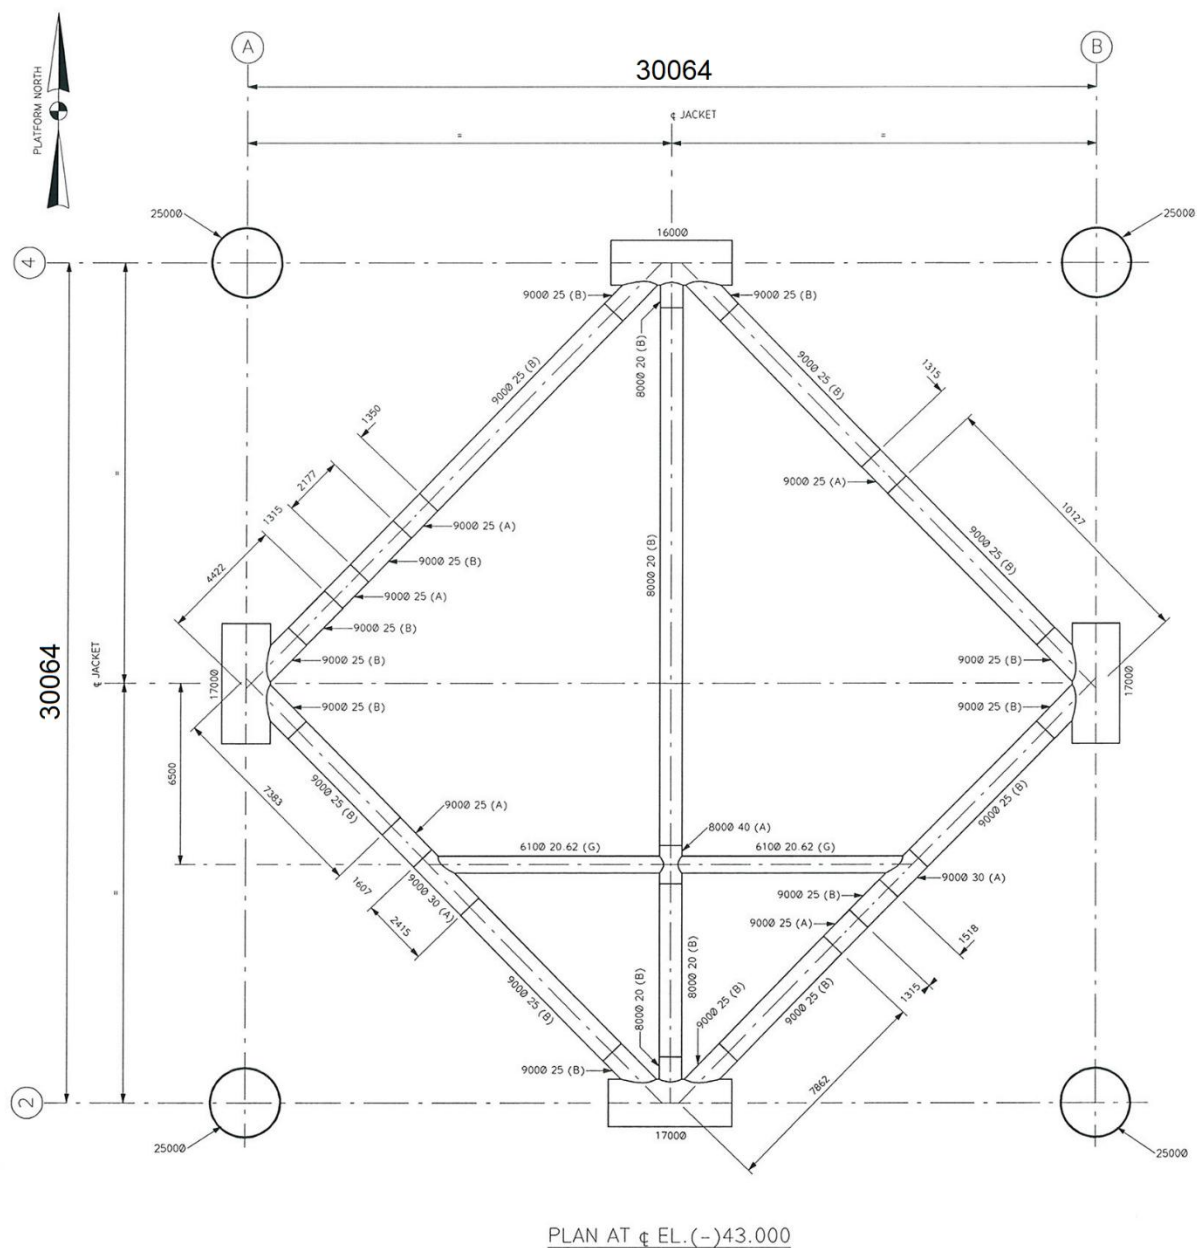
Solan jacket bracing plan at EL. -43.000
